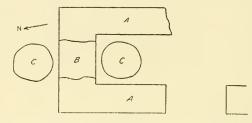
Ground plan of building above subterranean chamber, Mound 22. a, Stucco-covered walls 18 inches thick. b, Irregularly shaped hole in the wall measuring 2 feet 3 inches by 2 feet. c, Circular openings to underground chambers.
